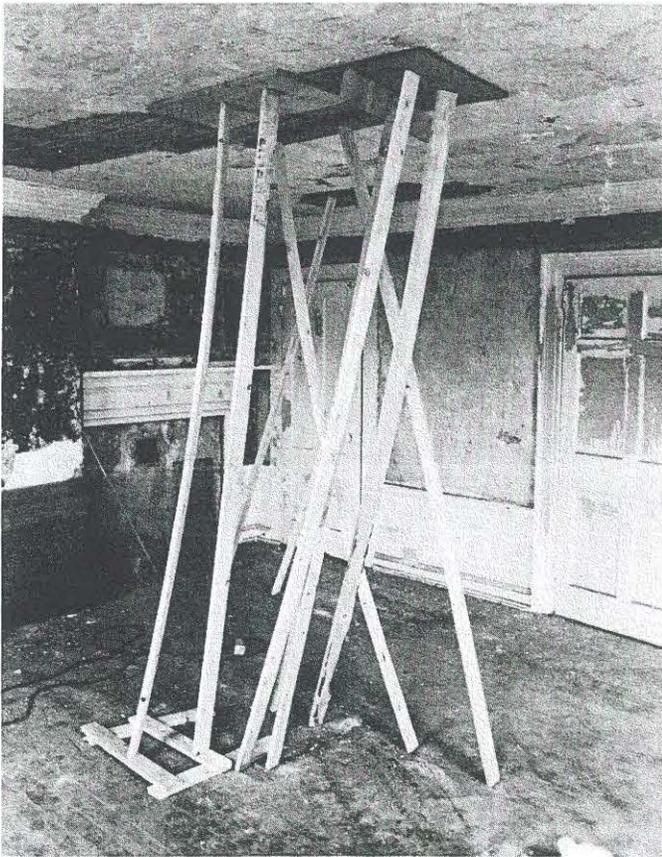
When ceiling repairs are made with wet plaster or with an injected adhesive mixture, the old loose plaster must be supported with a plywood brace until re-keying is complete. Photo: John Leeke.
